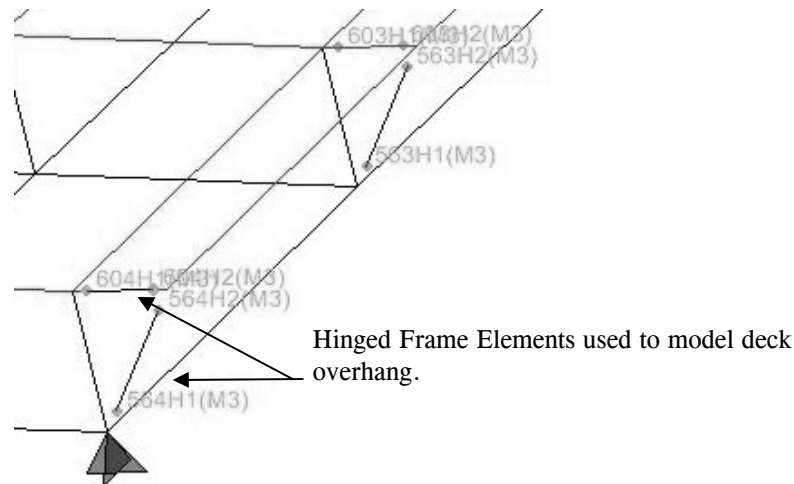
False Members Used to Support Cantilevered Slab at Abutment, Structure #207 (Shura 2005).
